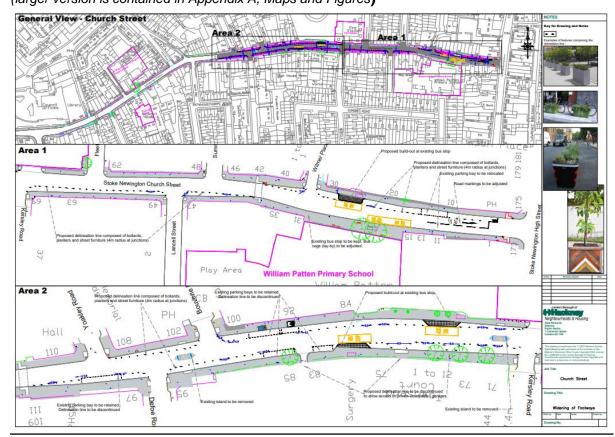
Stoke Newington proposed bus boarders and pavement widening (larger version is contained in Appendix A; Maps and Figures)
